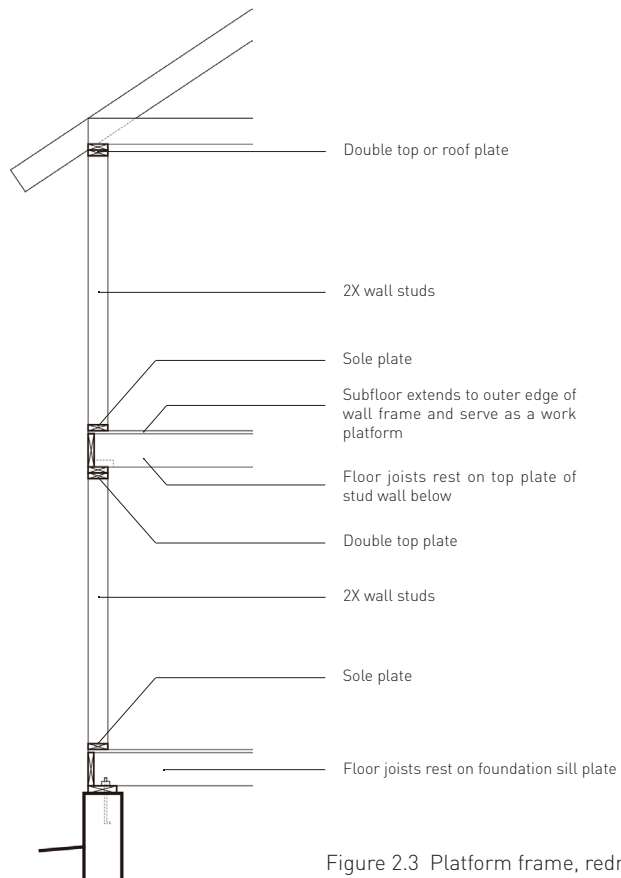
Platform frame, redrawn by author (Ching, 2014)
